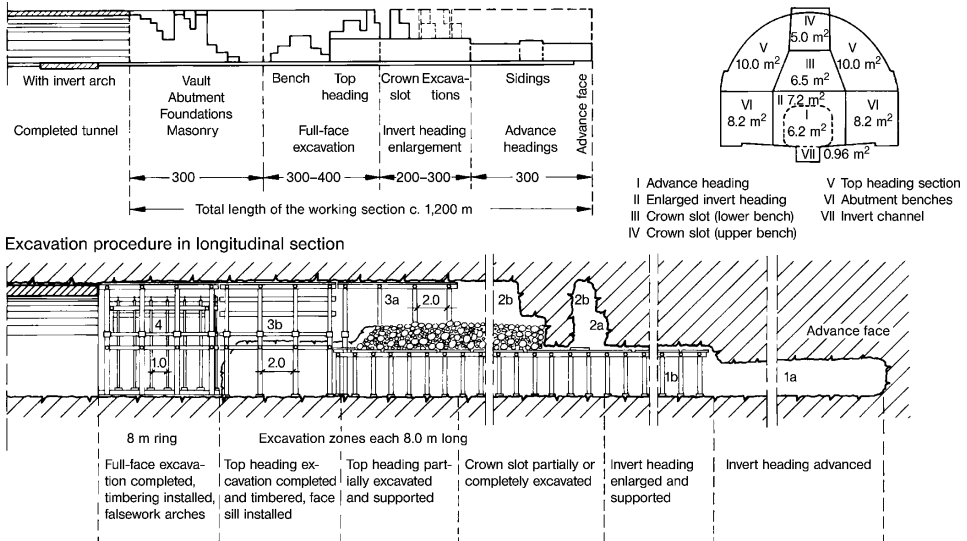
Diagram of the working method for excavation and timbering (support) in the Hauenstein Base Tunnel [257].
